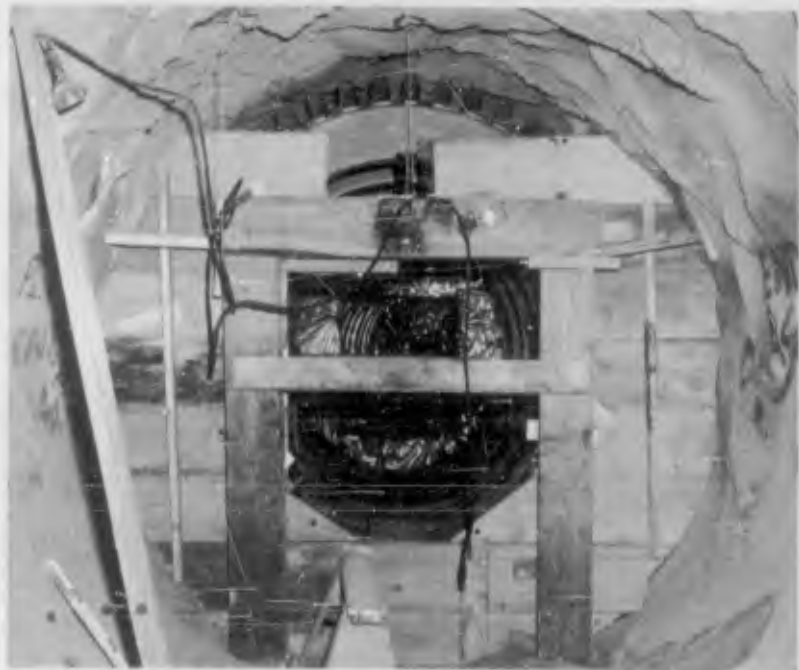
Installing end bulkhead, wide-flange rings with corrugated steel decking. (H&N-AEC 789-4, 1960).
